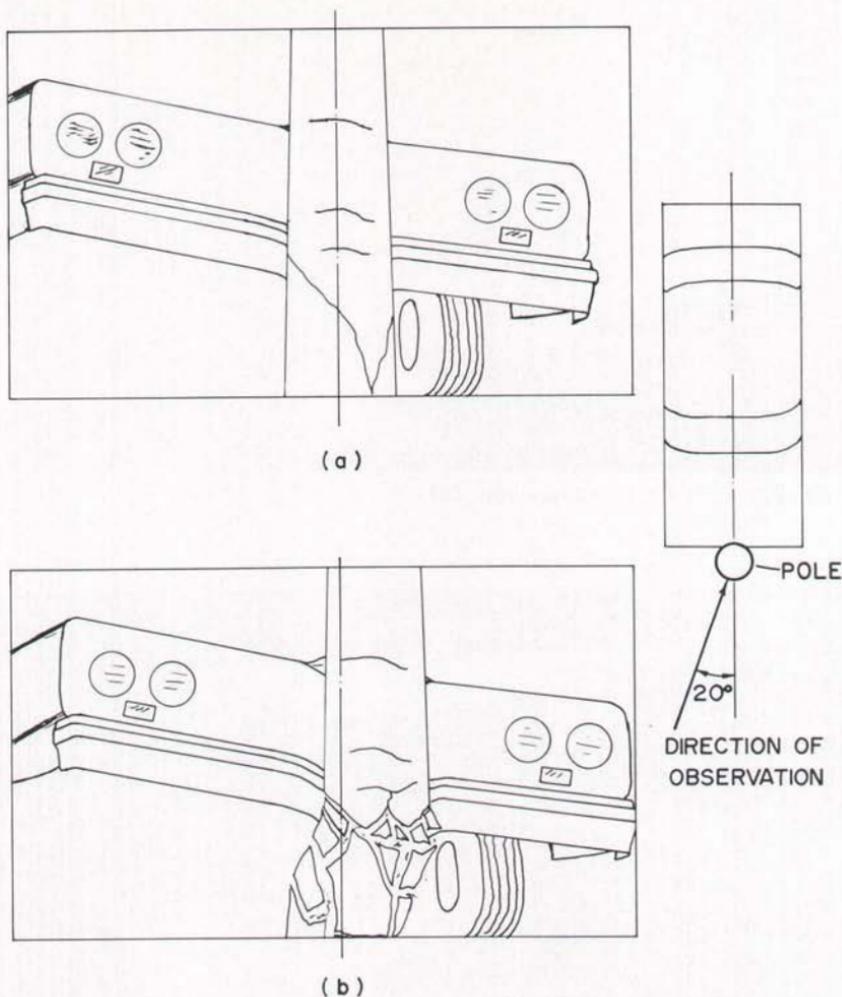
First cracks (a) and shear failure (b) of Pole 3.
